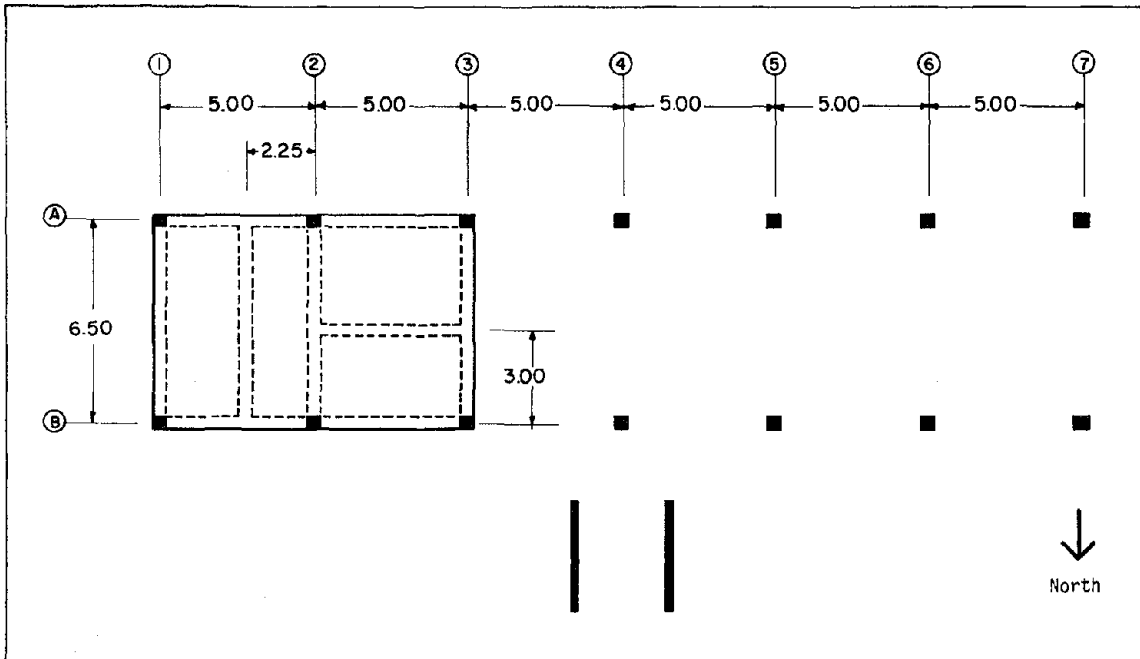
STRUCTURAL PLAN OF THE ESCUELA DE NIÑERAS
